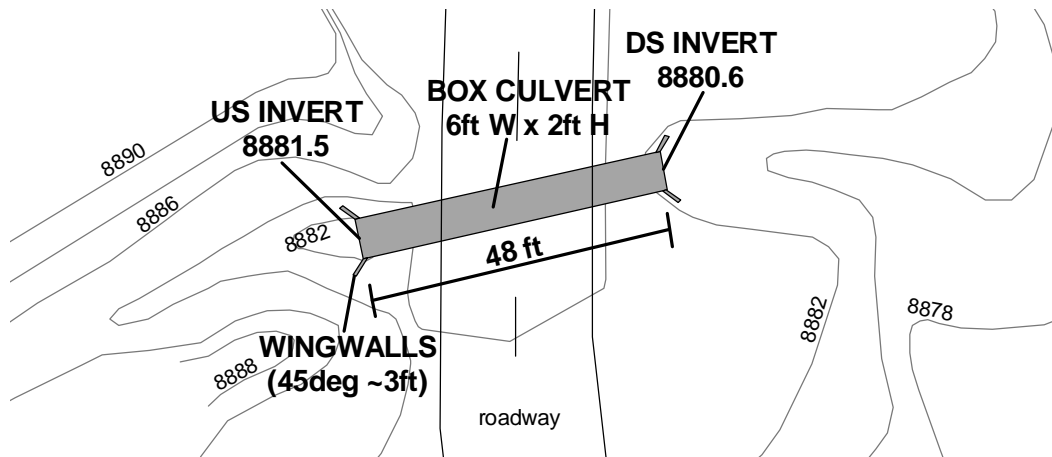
Windy Gulch 57cfs box culvert plan view
